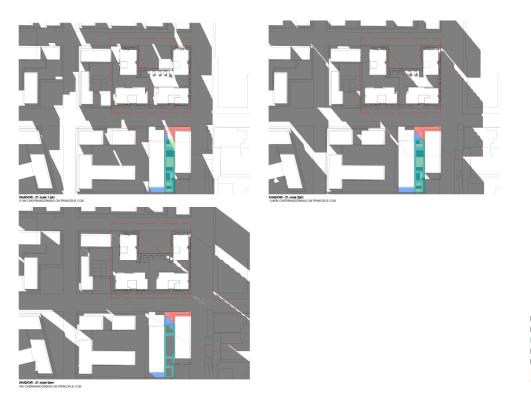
Proposed and existing overshadowing onto 8 Bourke Street midwinter between 1pm to 3pm
